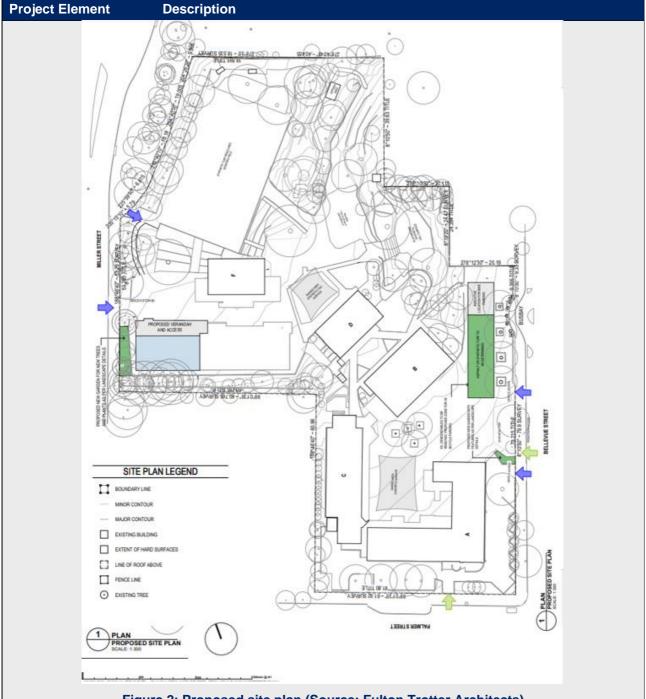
Proposed site plan (Source: Fulton Trotter Architects)
